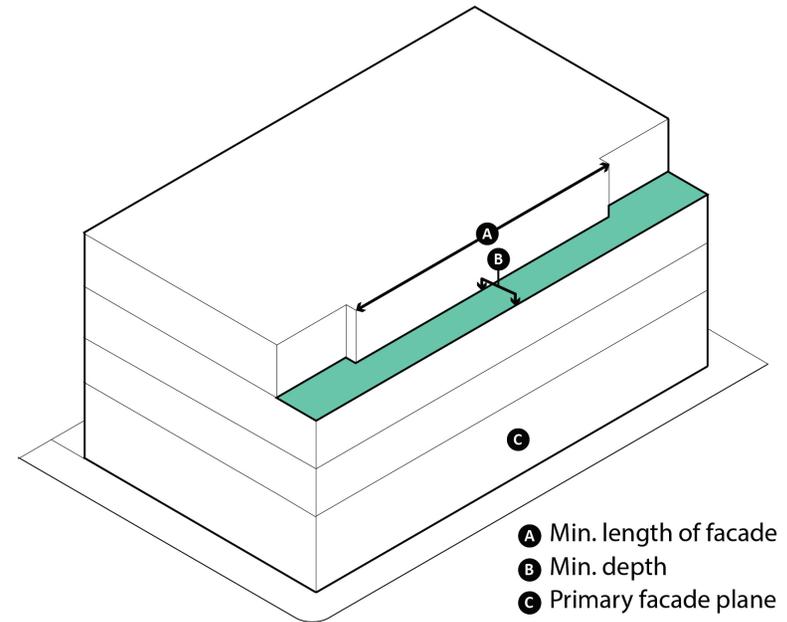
Smaller Building Mass on the Uppermost Floor
